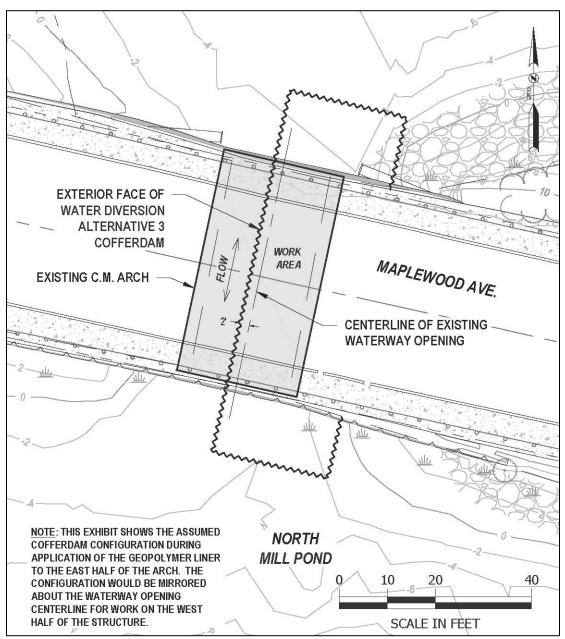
Water Diversion Alternative 3 Schematic Plan
